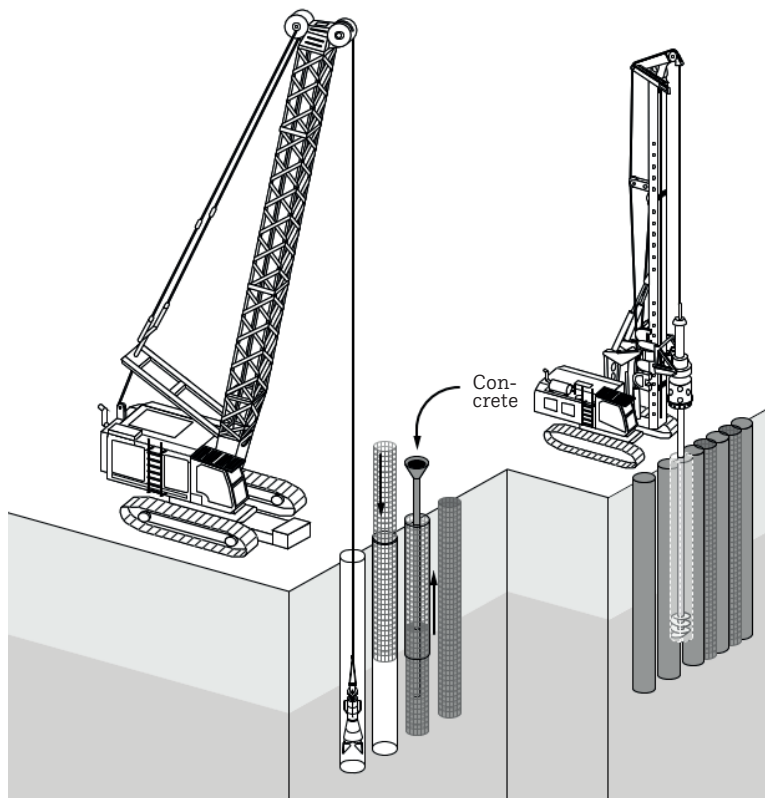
Manufacturing methods of an insulating bore pile wall. Left: fully cased grab-excavation. Right: continuous flight auger piles [7]
